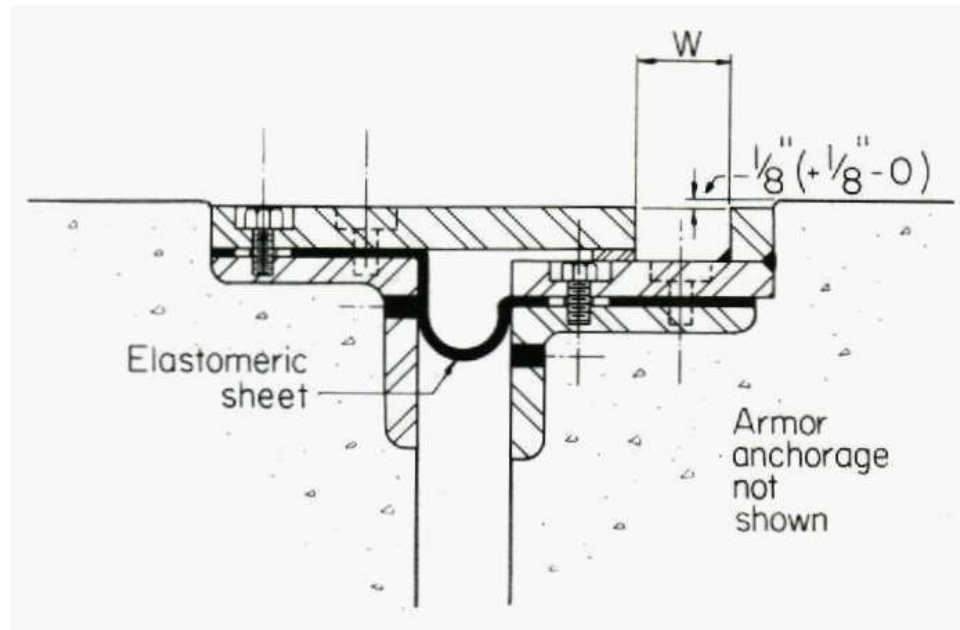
Cross Section of a Sliding Plate Joint
